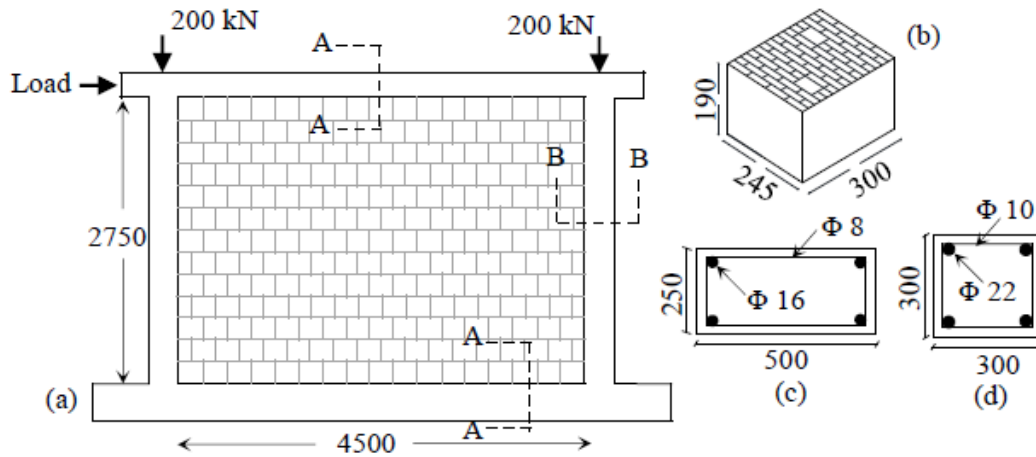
Geometric details (dimensions in mm) of (a) the tested infilled frame, (b) the perforated clay block (brick unit), (c) top and bottom beam (section A-A), (d) column (section B-B).
